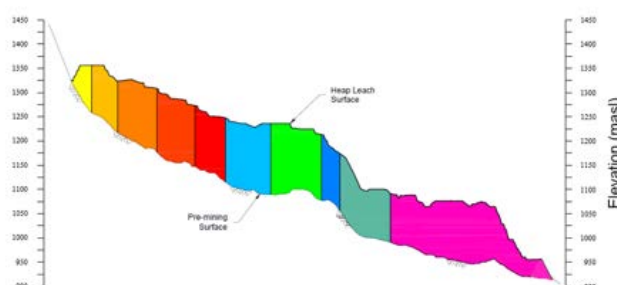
Elevation profile through a typical valley-fill type heap leach facility
